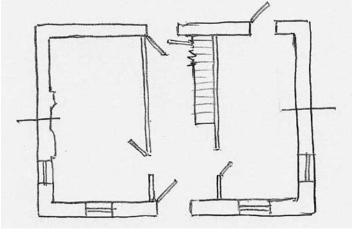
Amended sketch plan of John A. DeWitt Tenant House (a.k.a. Henry Brodhead House) drawn by Ken Krabbenhoft.
